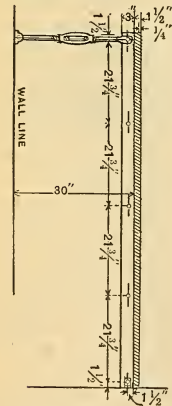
Showing Method of Bracing Switchboard Panel to Wall.
